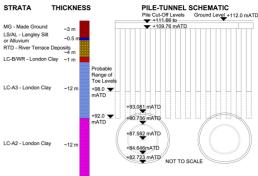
Tunnelling beneath KC piled building for Crossrail, London (Williamson 2014).
